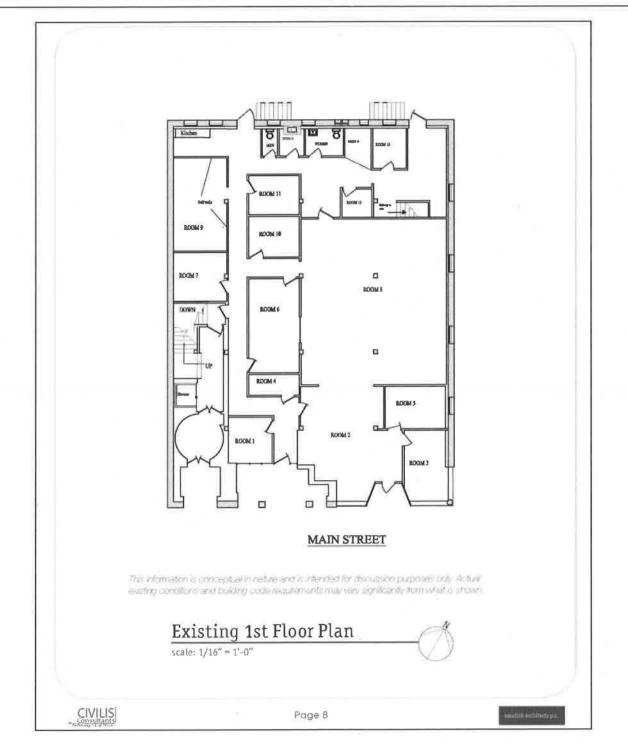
Existing 1st Floor Plan, taken from emerick architects' Adaptive Reuse Case Study. See Bibliography.
